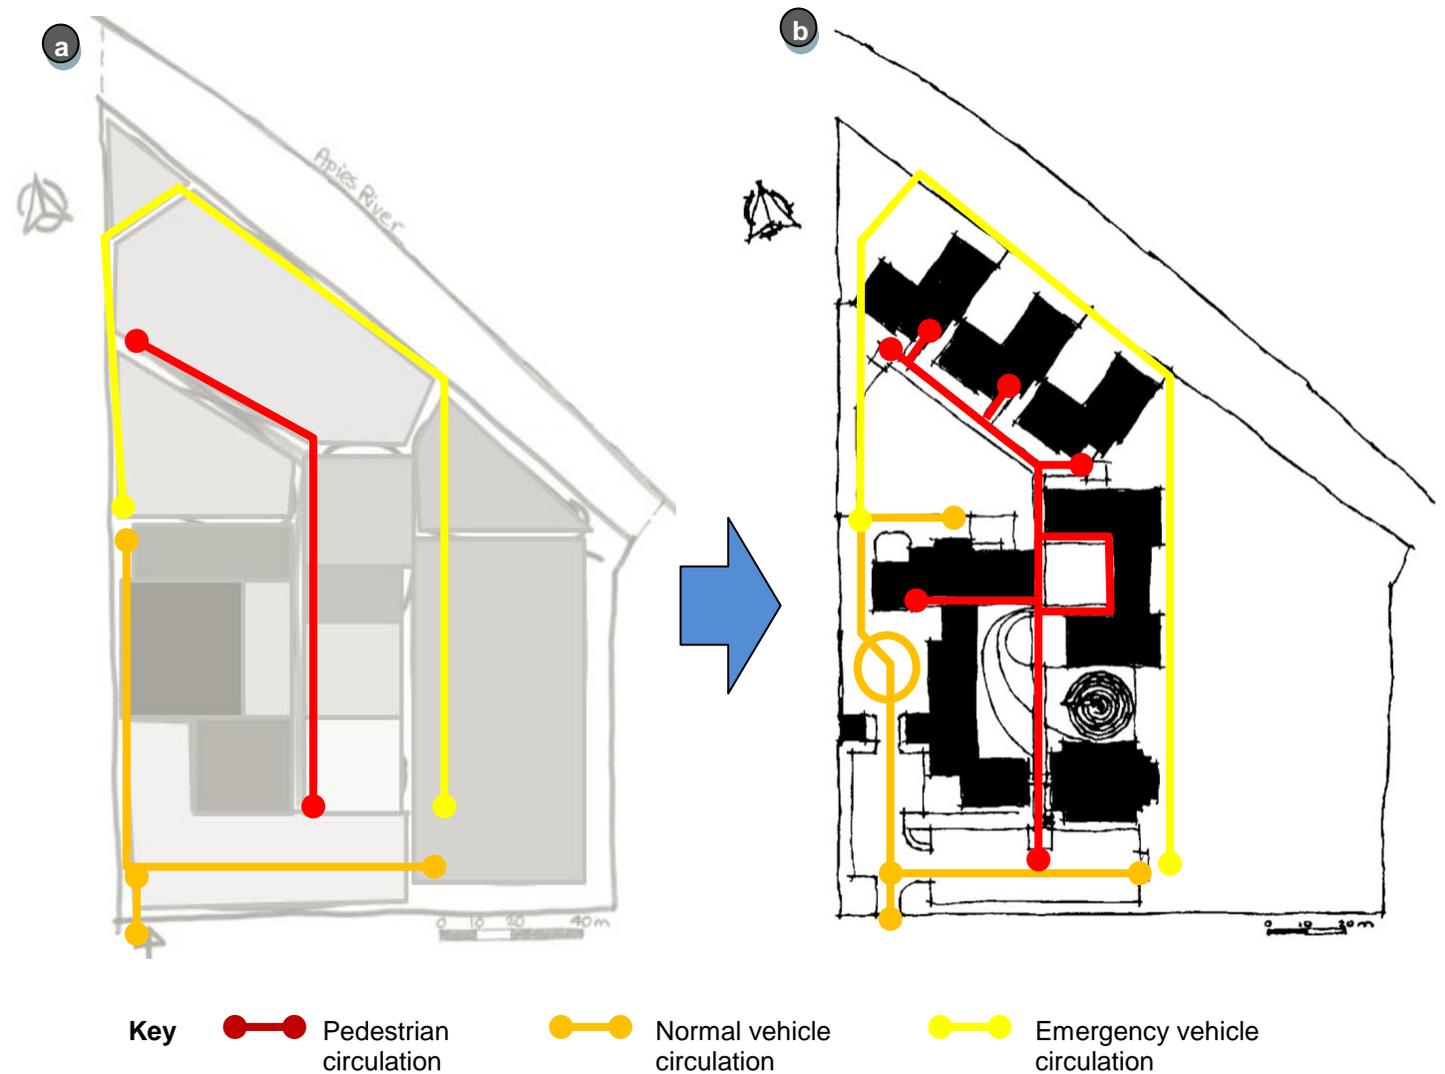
Site plans showing (a) initial circulation layout and (b) final circulation design
